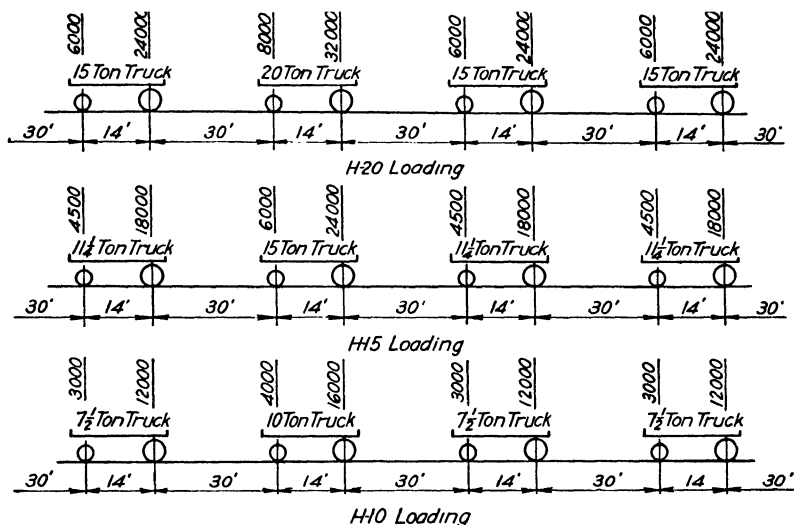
HIGHWAY BRIDGE LOADINGS.
